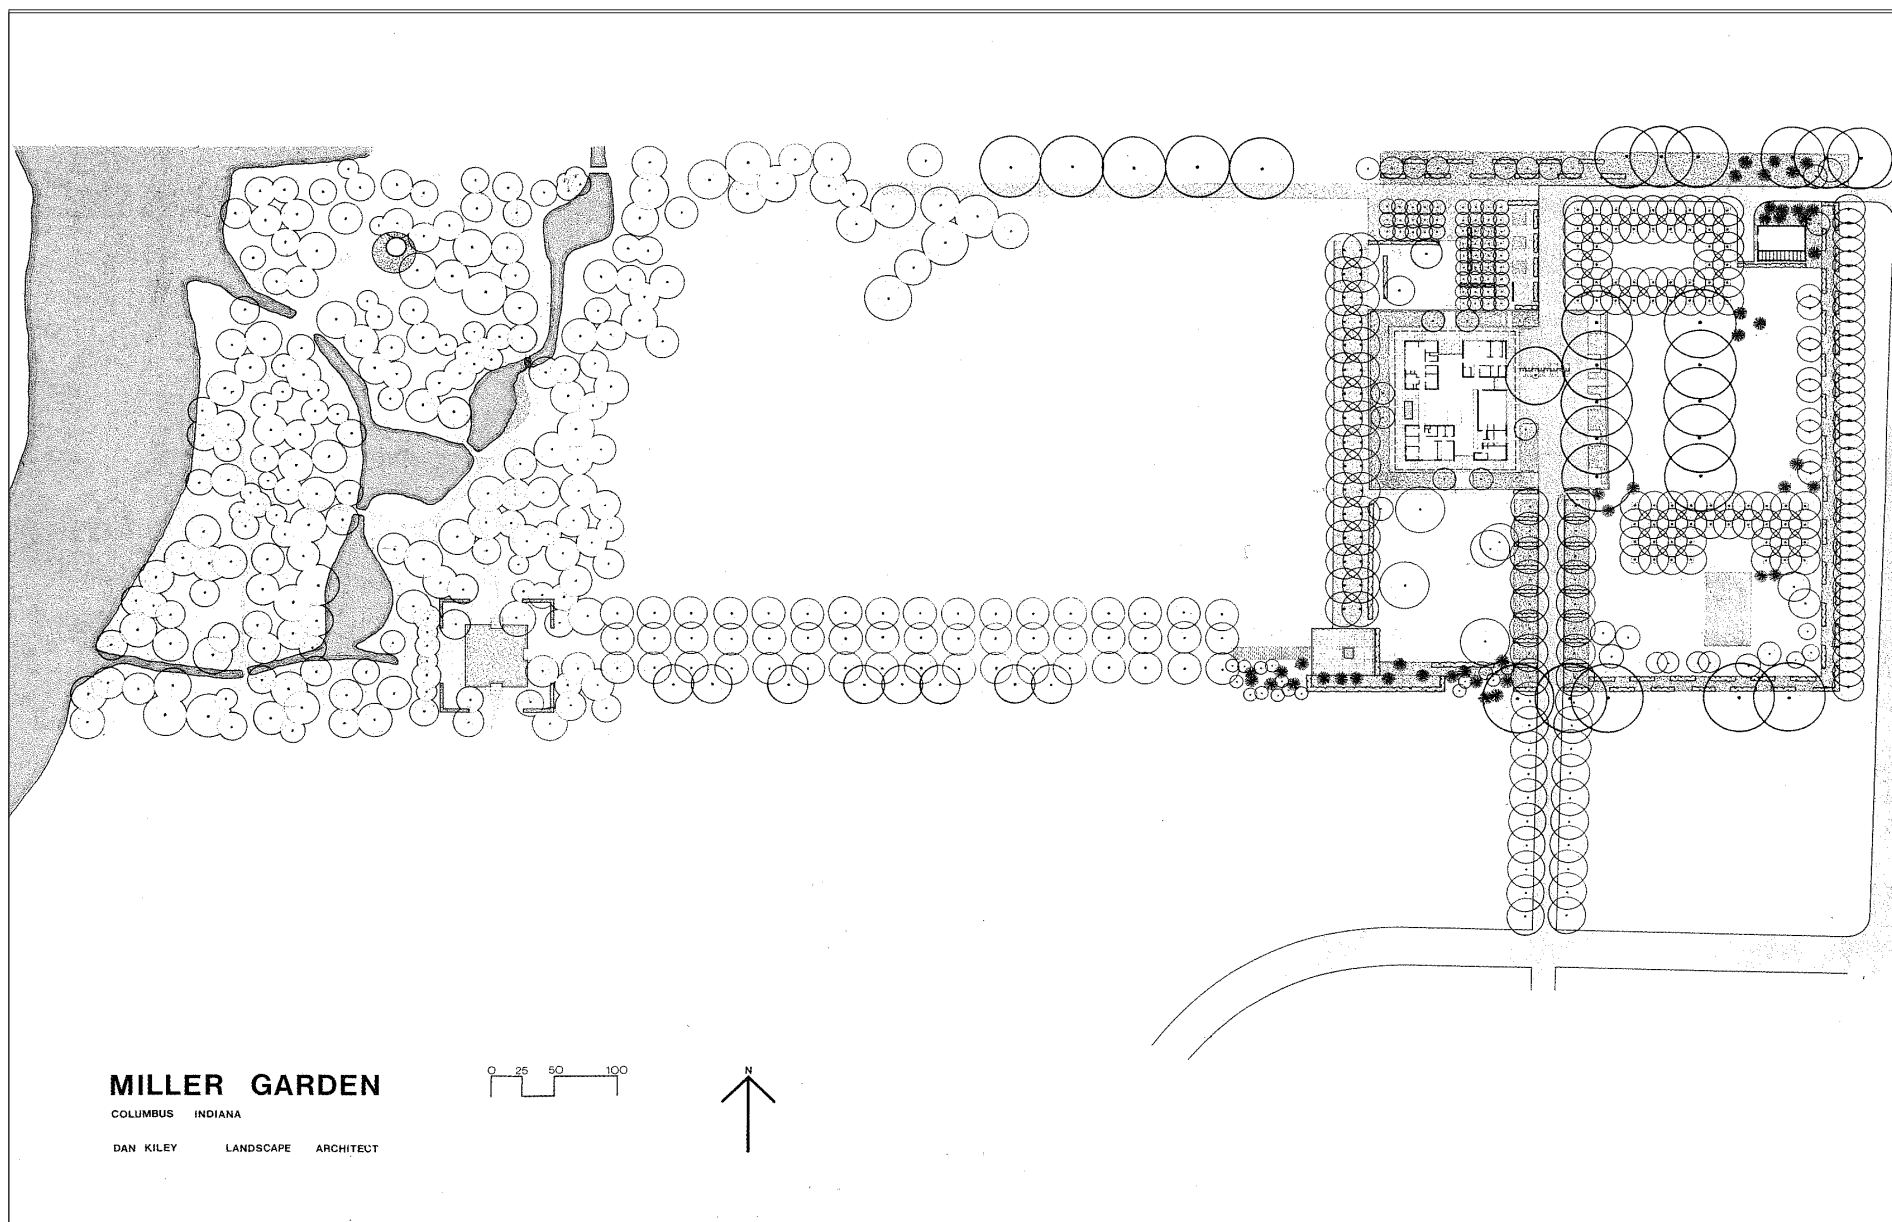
Kiley's final published plan of Miller House and Garden landscape. Date: 1957. Photo credit: Brooks 2011, endpapers.
